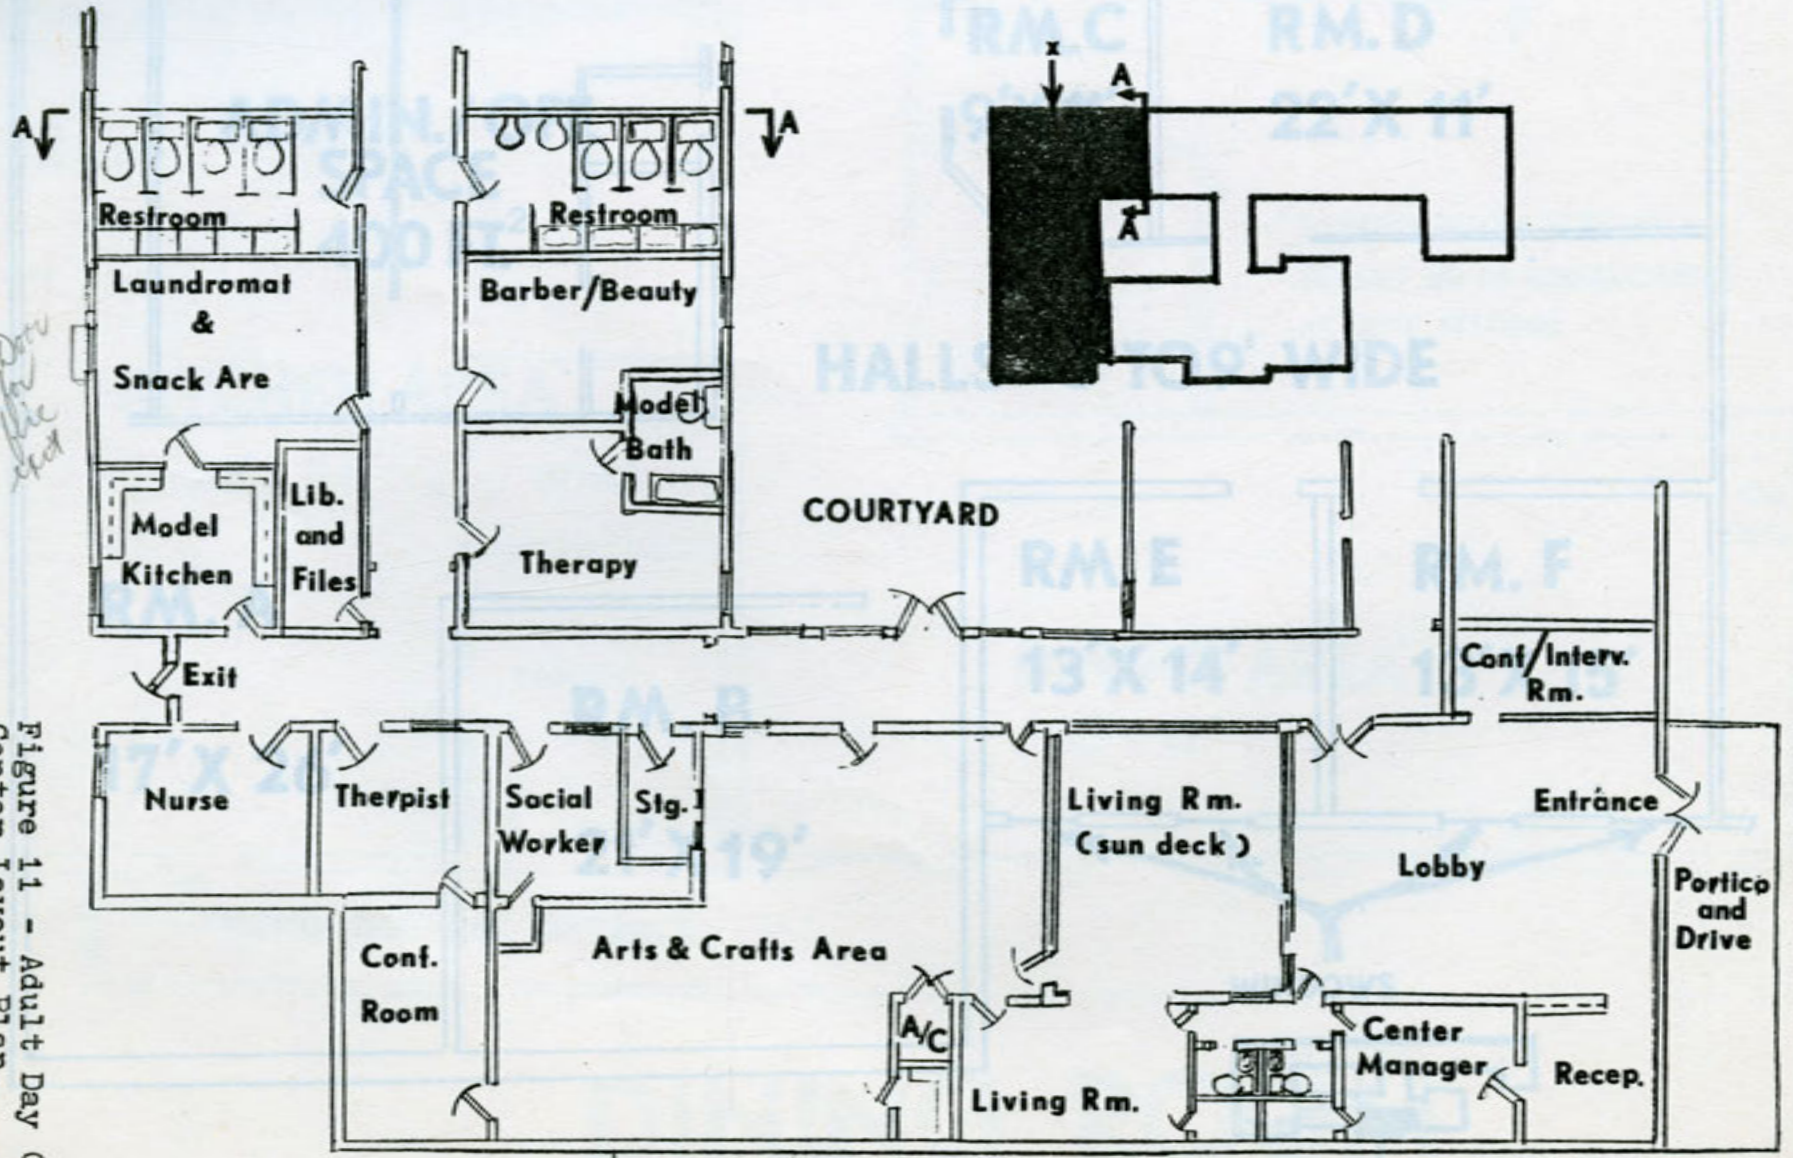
Adult Day Care Center Layout Plan. (Scale 1/16" = 1'0")
